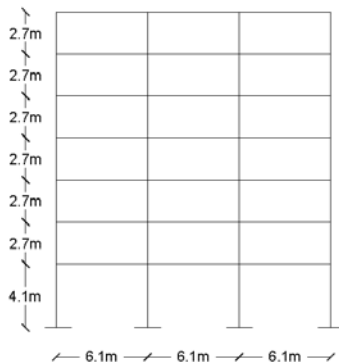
Geometric configuration of the transverse frame. Configurazione geometrica del telaio trasversale.
